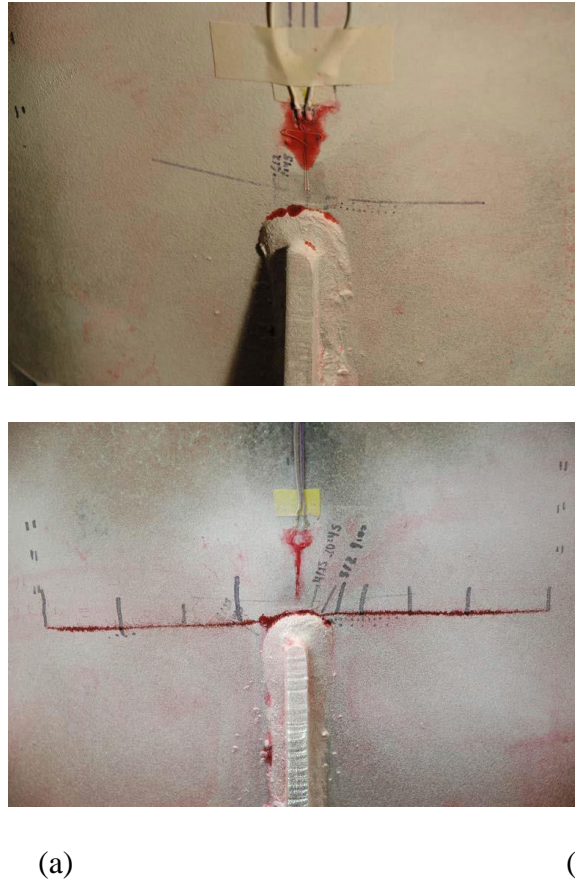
Fatigue cracking for stiffened fillet-weld connection (a) First crack at weld toe, (b) Final crack at termination of fatigue testing
